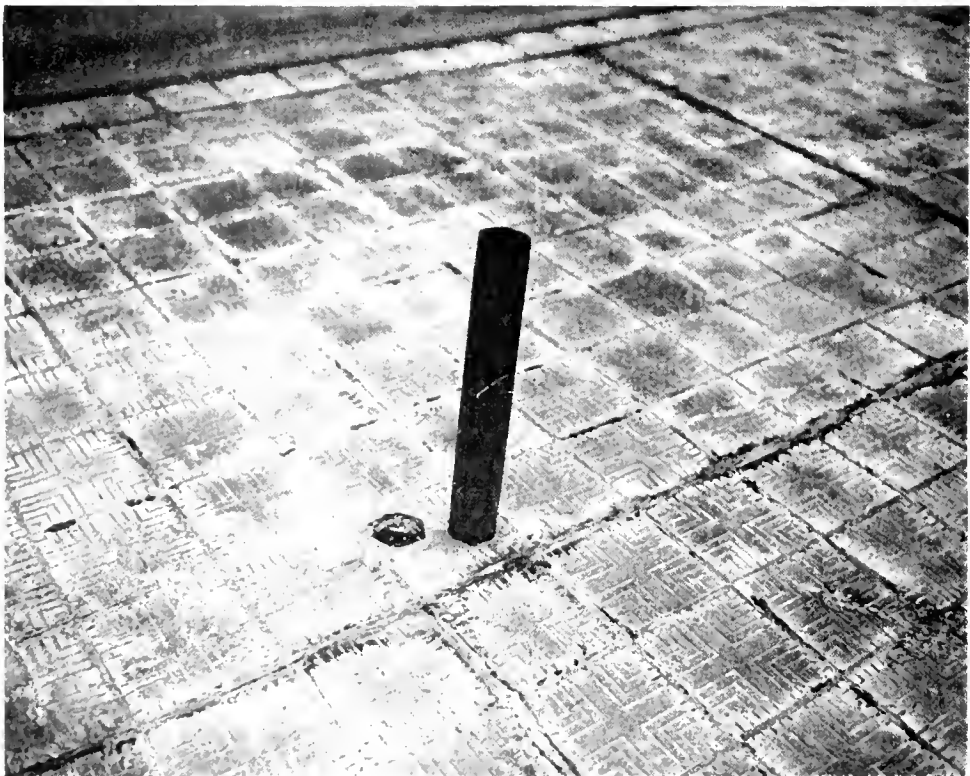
Oshima substation—View of mark on concrete tile roof made by incendiary bomb.
